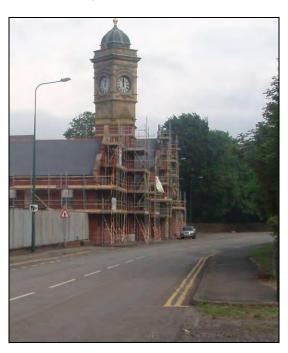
Steelworks Road (from Junction with Libanus Road Roundabout view North)
